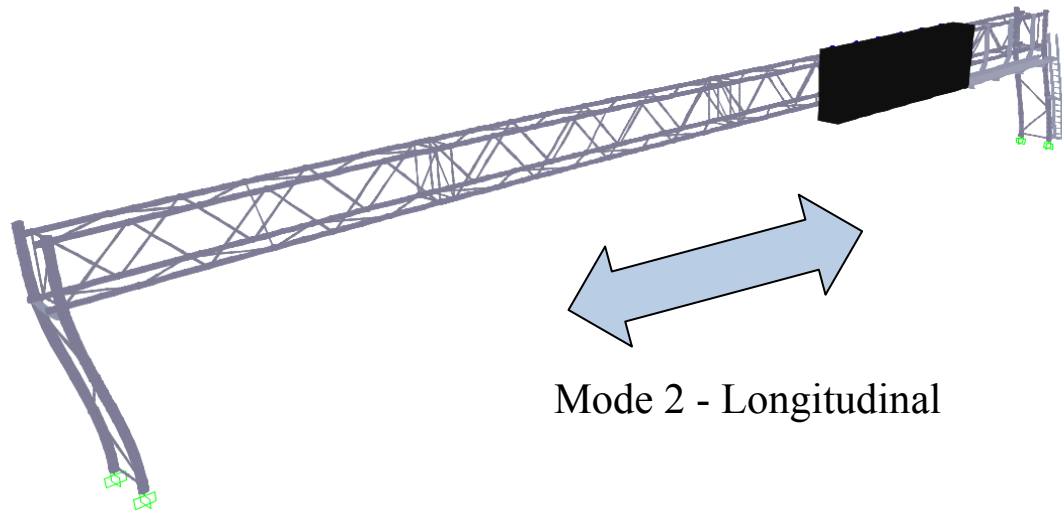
Structure B Mode Shape 2 – Longitudinal
